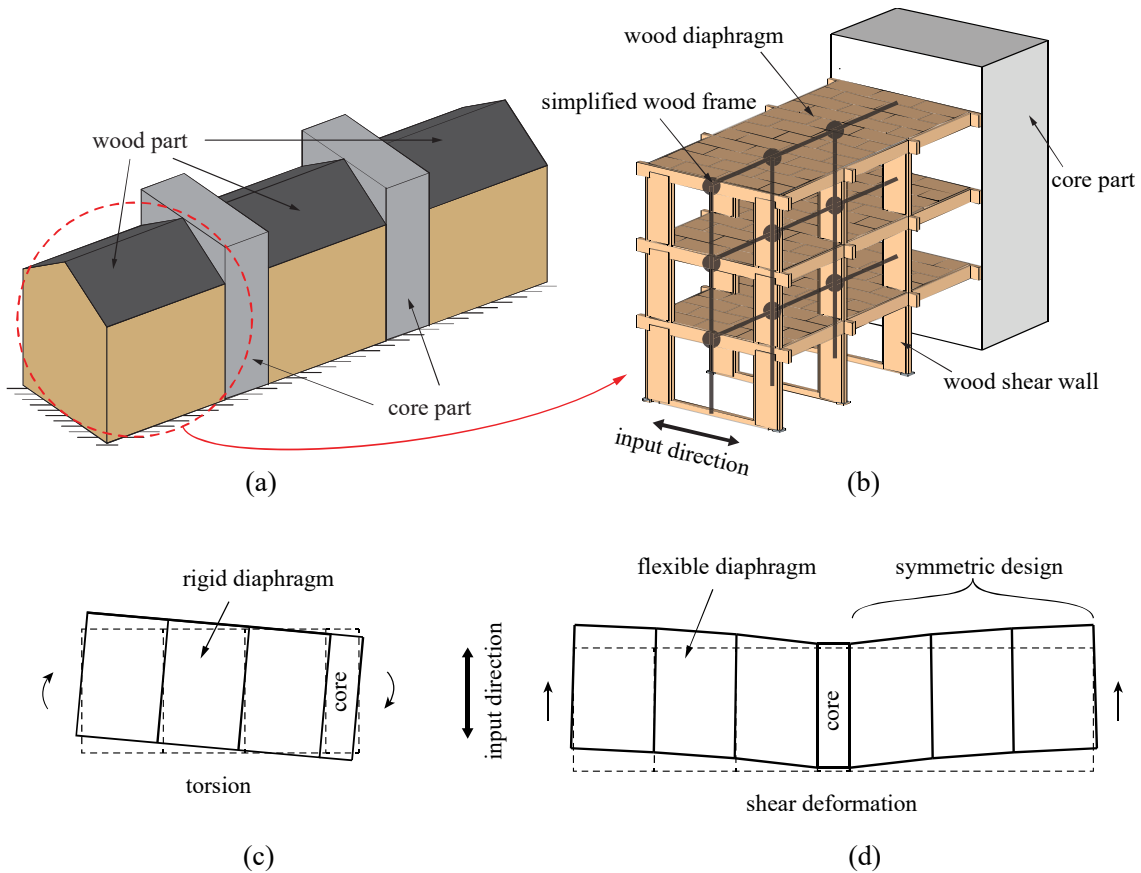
Typical type of wooden horizontal hybrid structure (a) general layout; (b) one kind of detailed design of the wood part and the possible simplified frame; and relative deformation mechanism (c) building with rigid diaphragm; (d) building with flexible diaphragm and symmetric design
